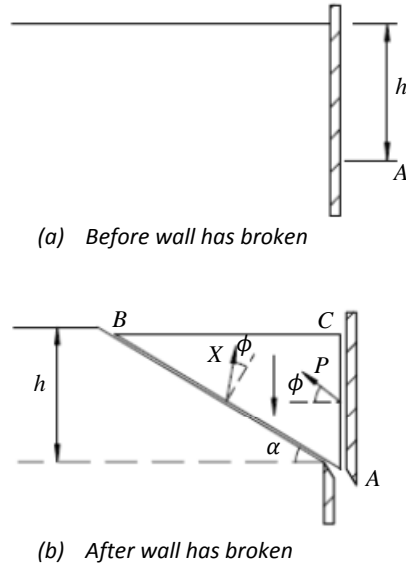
Failure of a retaining wall (Nedderman 1992)
